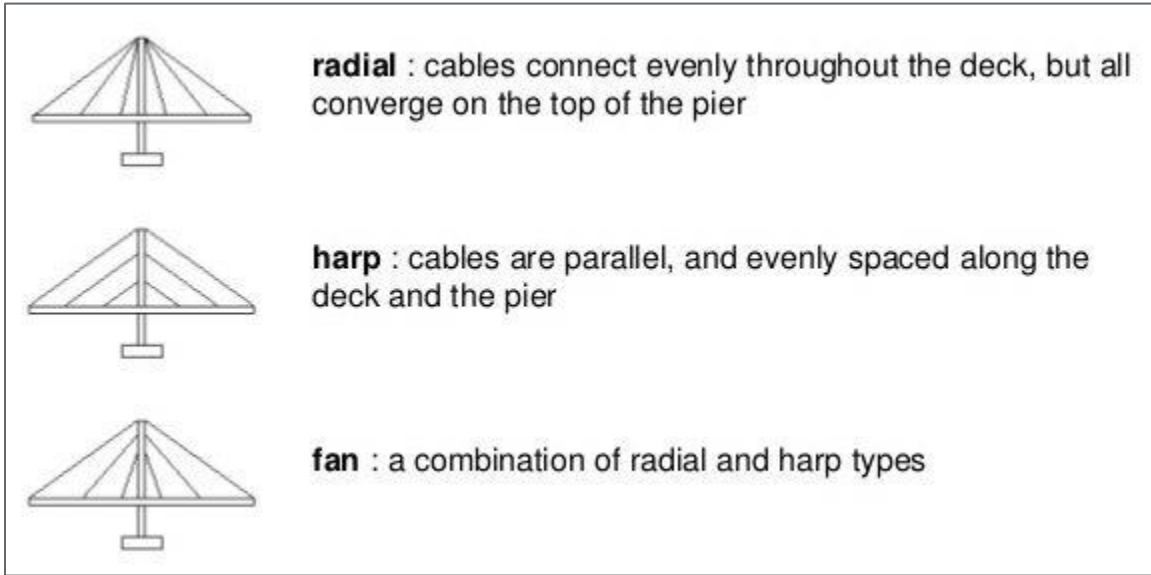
COMMON CABLE STAY LAYOUTS
